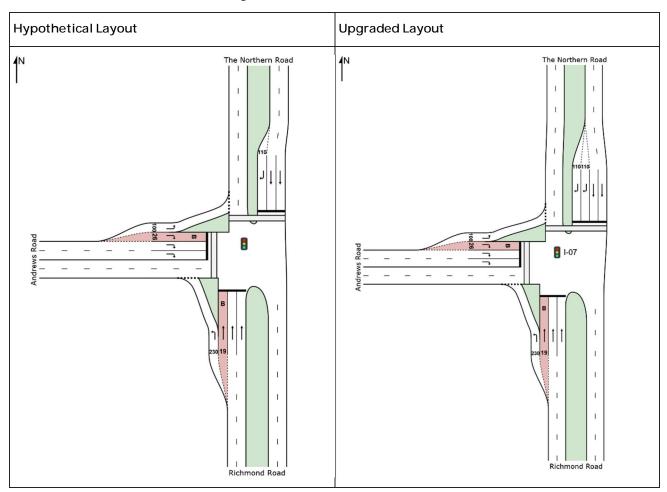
2031 with Links Road extension - The Northern Road/Andrews Road
